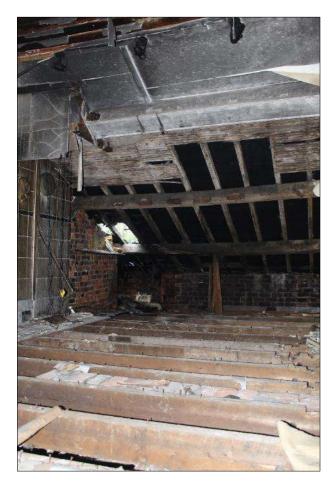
(shot 94): General view of the first floor of Structure B, looking northwest
